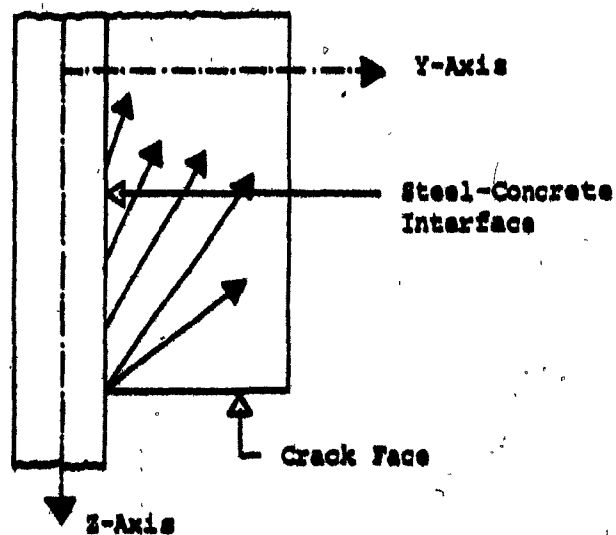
Principal Tensile Stresses at Steel-Concrete Interface in Axially Reinforced Concrete Prism Subjected to Tension (10)
